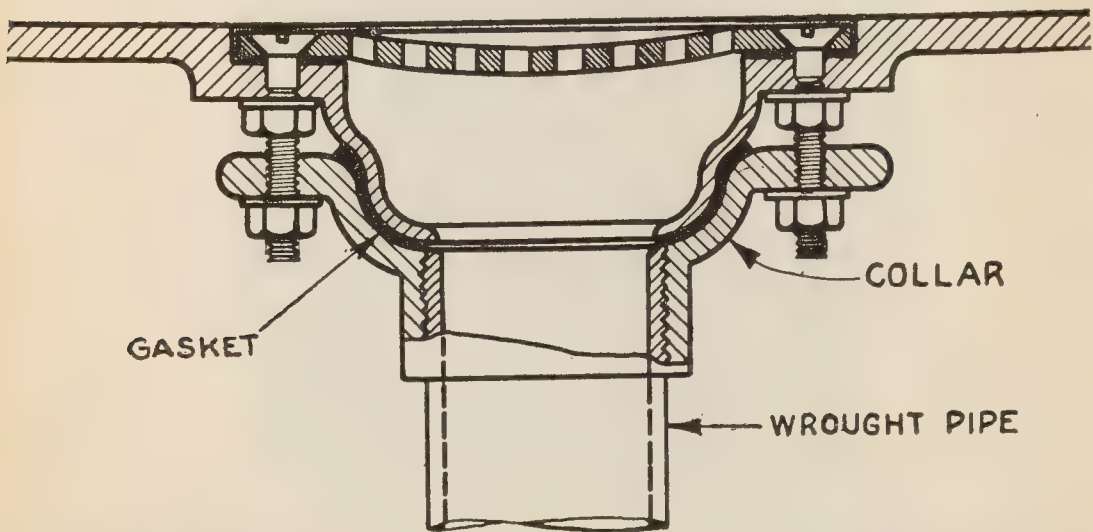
,665.—Cast iron sink waste connection for wrought pipe. note the rubber gasket and threaded collar.
